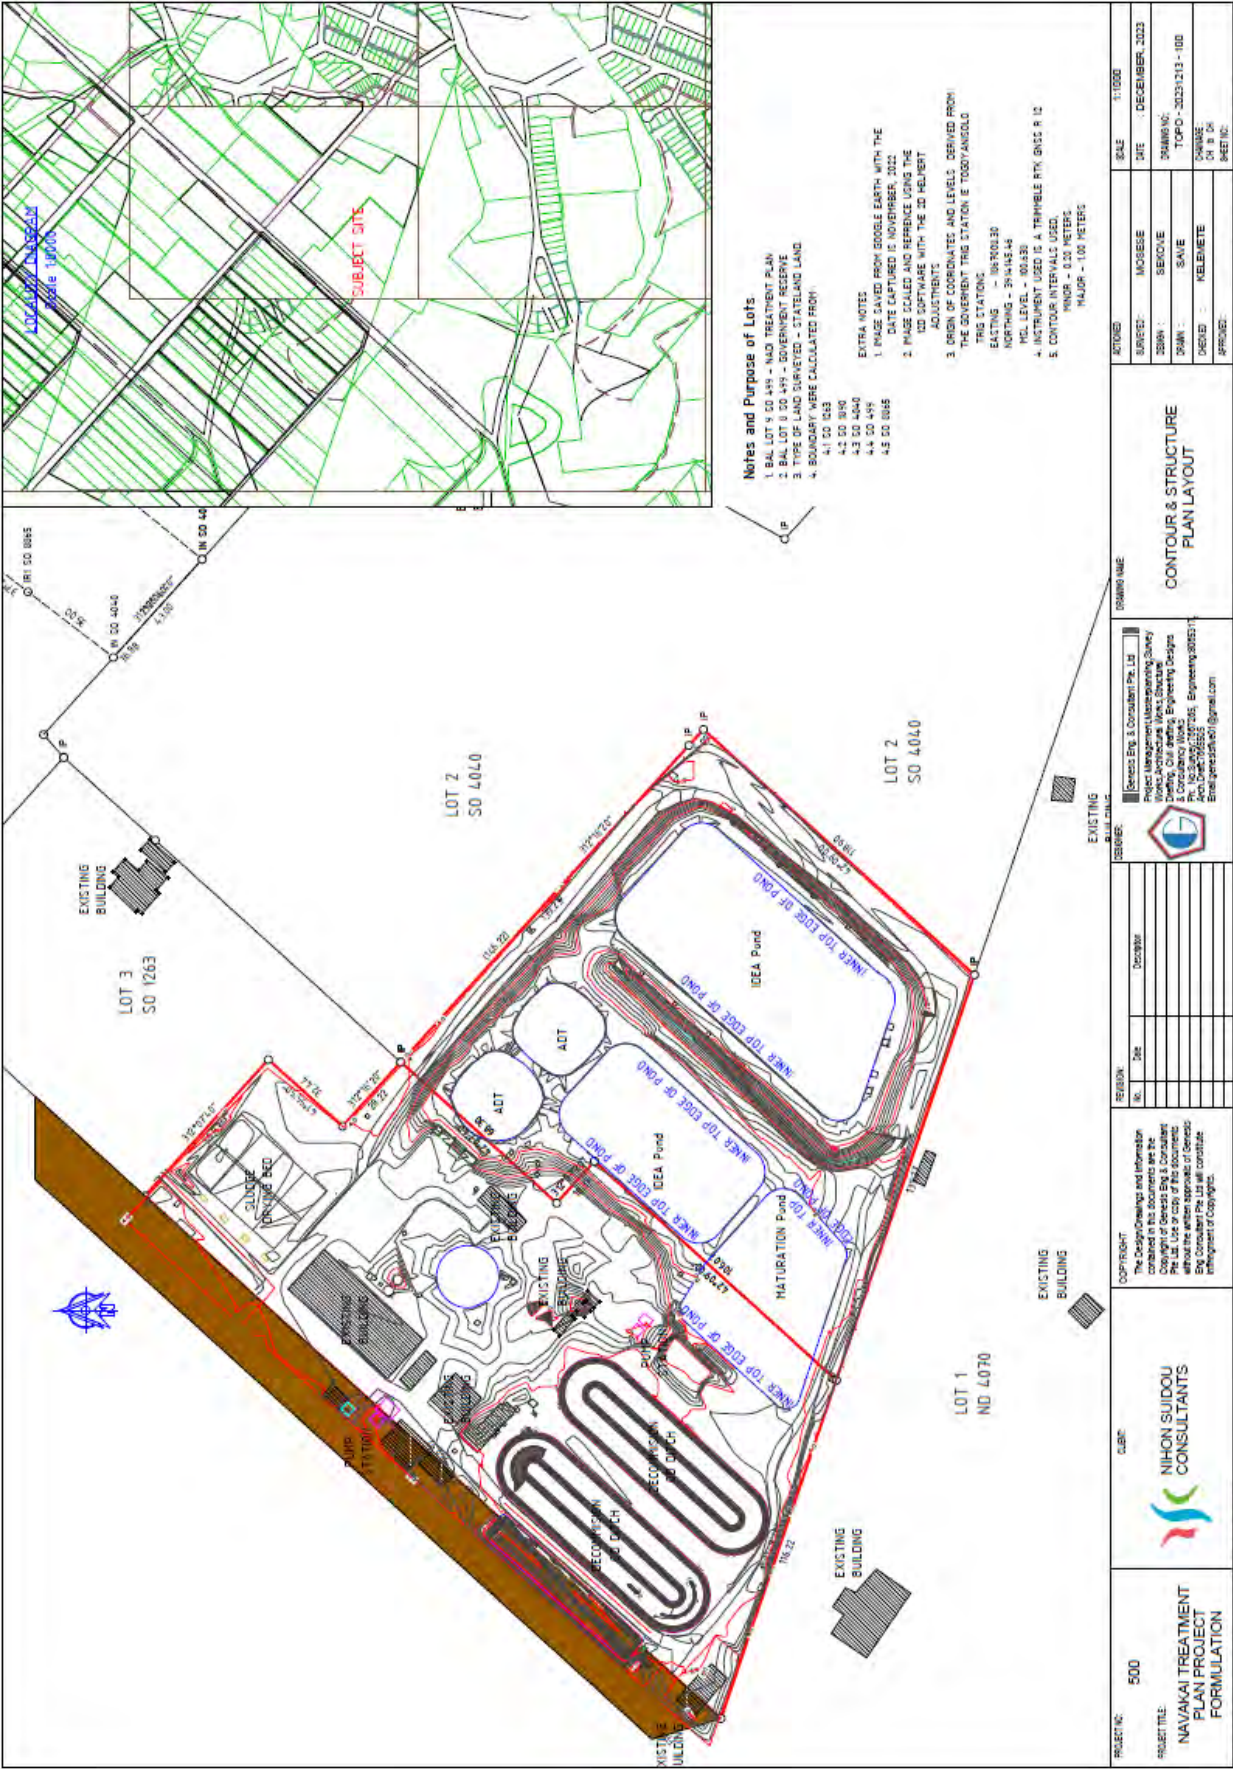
Navakai WWTP Alternative Layout Plan (Phase 1/Phase 2 Facilities)Table A4-3.6 Navakai WWTP Facilities (Alternative Layout)
